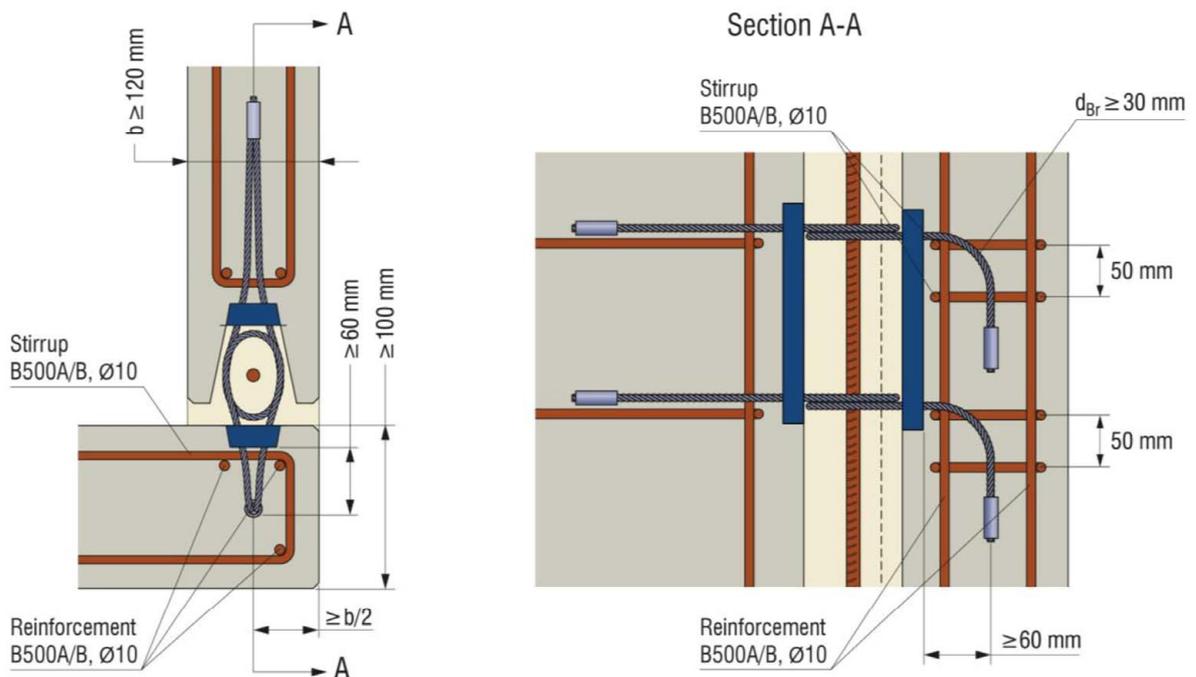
Wall – Wall – Corner connection - Detail with bended wire loops
